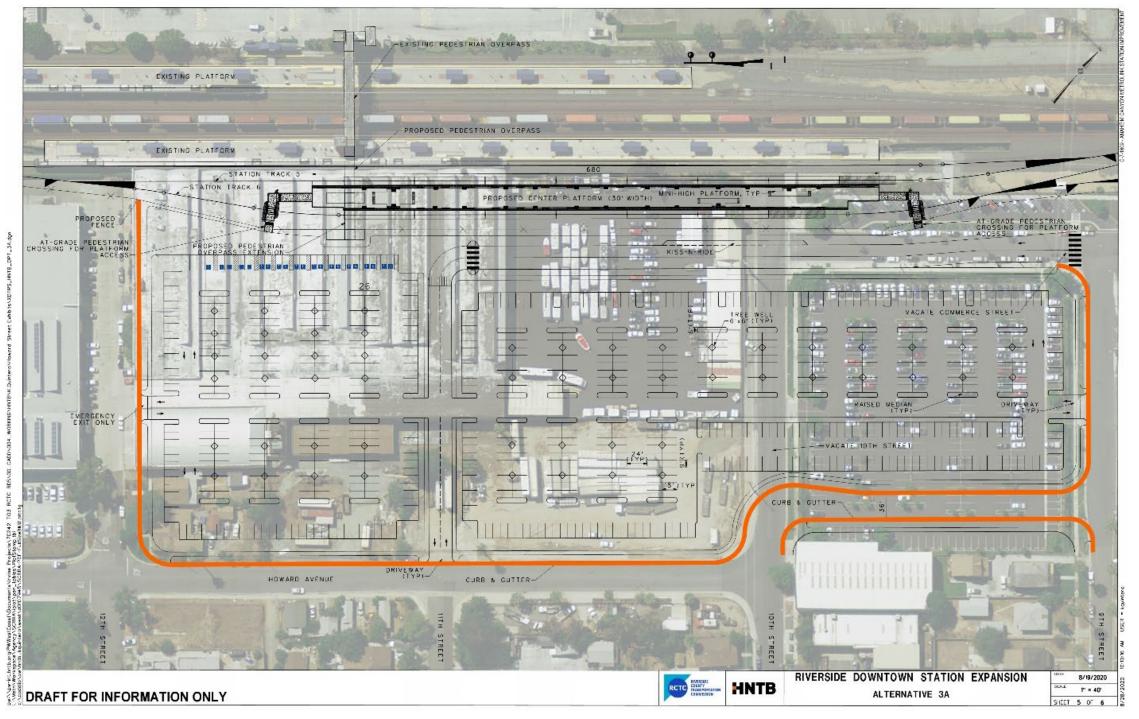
Build Alternative with Traffic Circulation and Parking Option 3A
